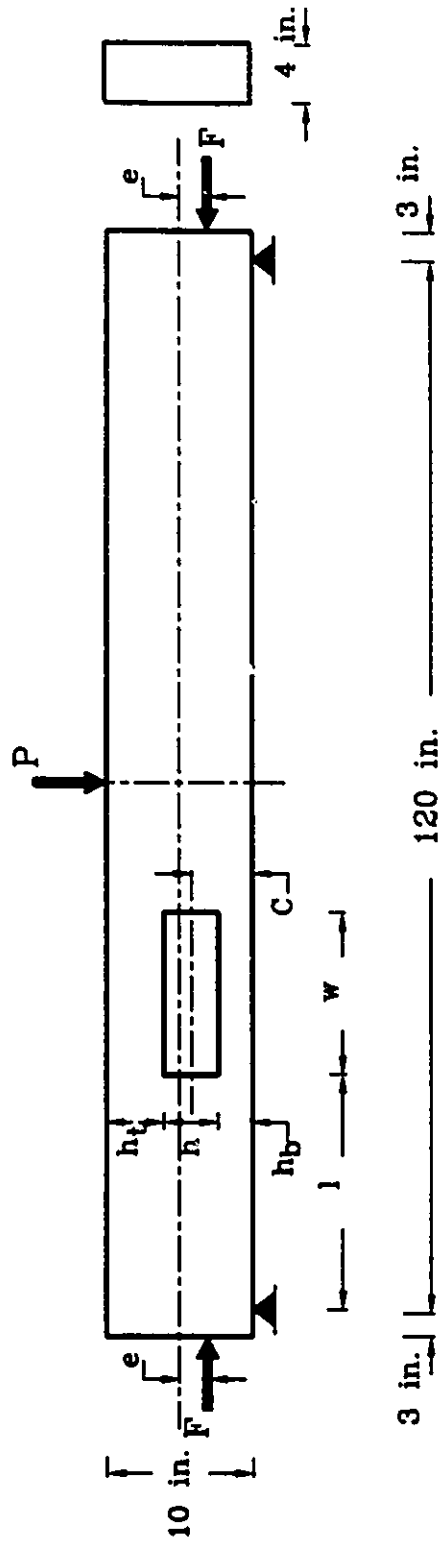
TYPICAL LAYOUT OF SIMPLY SUPPORTED BEAMS
